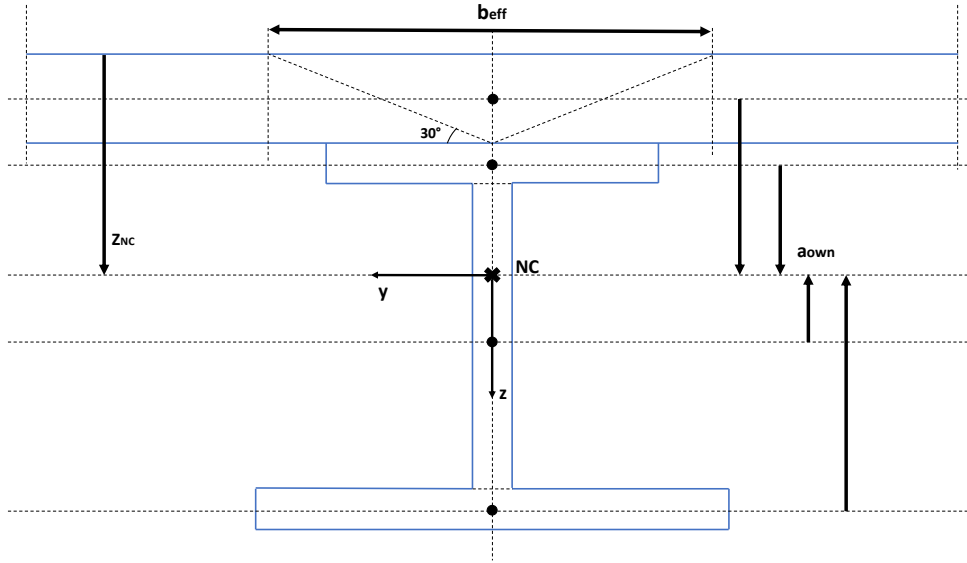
Cross-section of the girder bridge showing the normal force centre, the internal lever arms and the effective width of the concrete slab
